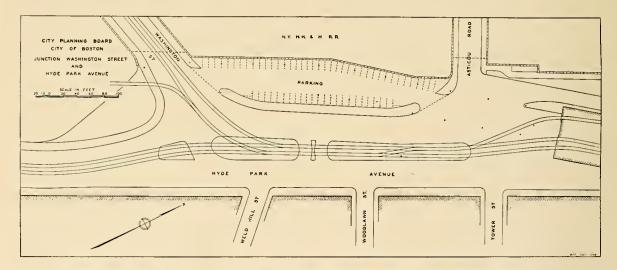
IMPROVEMENT AT JUNCTION OF WASHINGTON STREET AND HYDE PARK AVENUE.
